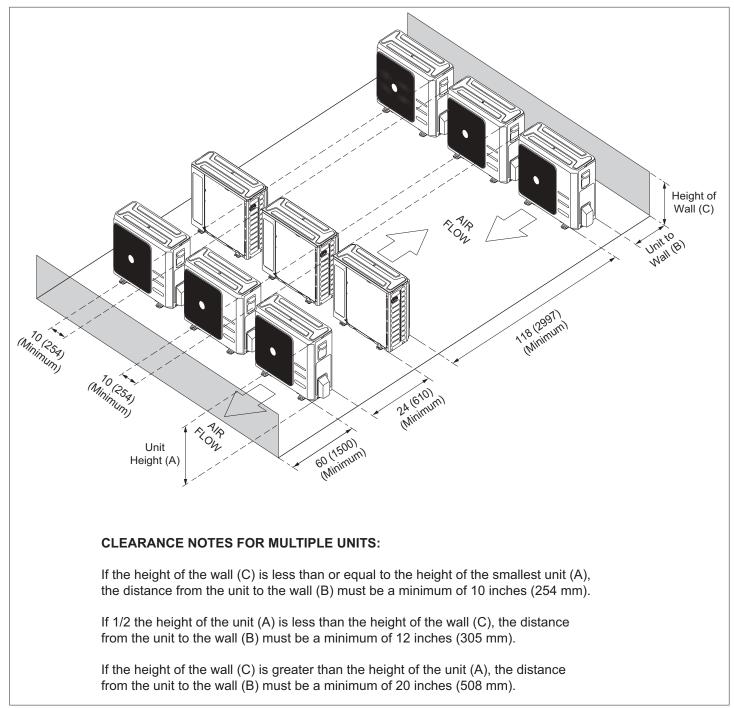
Multiple Outdoor Unit Clearances - Inches (mm)
